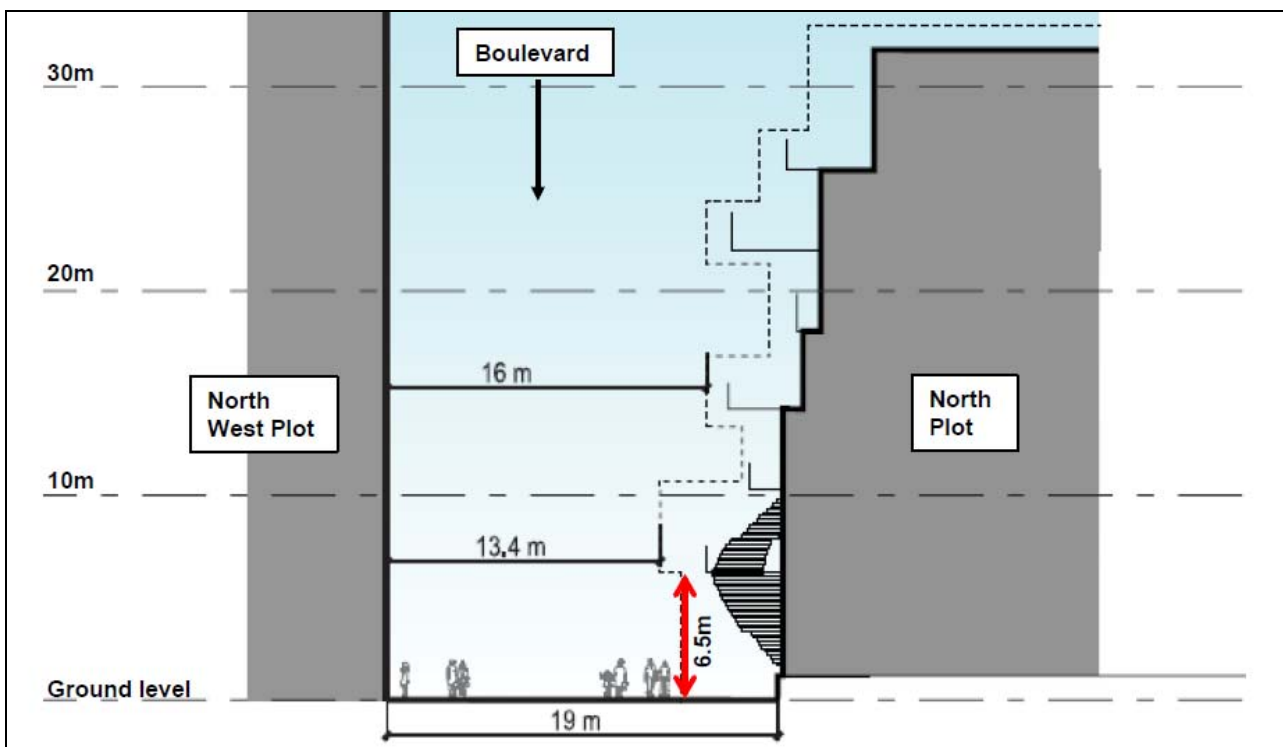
Proposed North and North West Plot building separation and relationship to the boulevard
